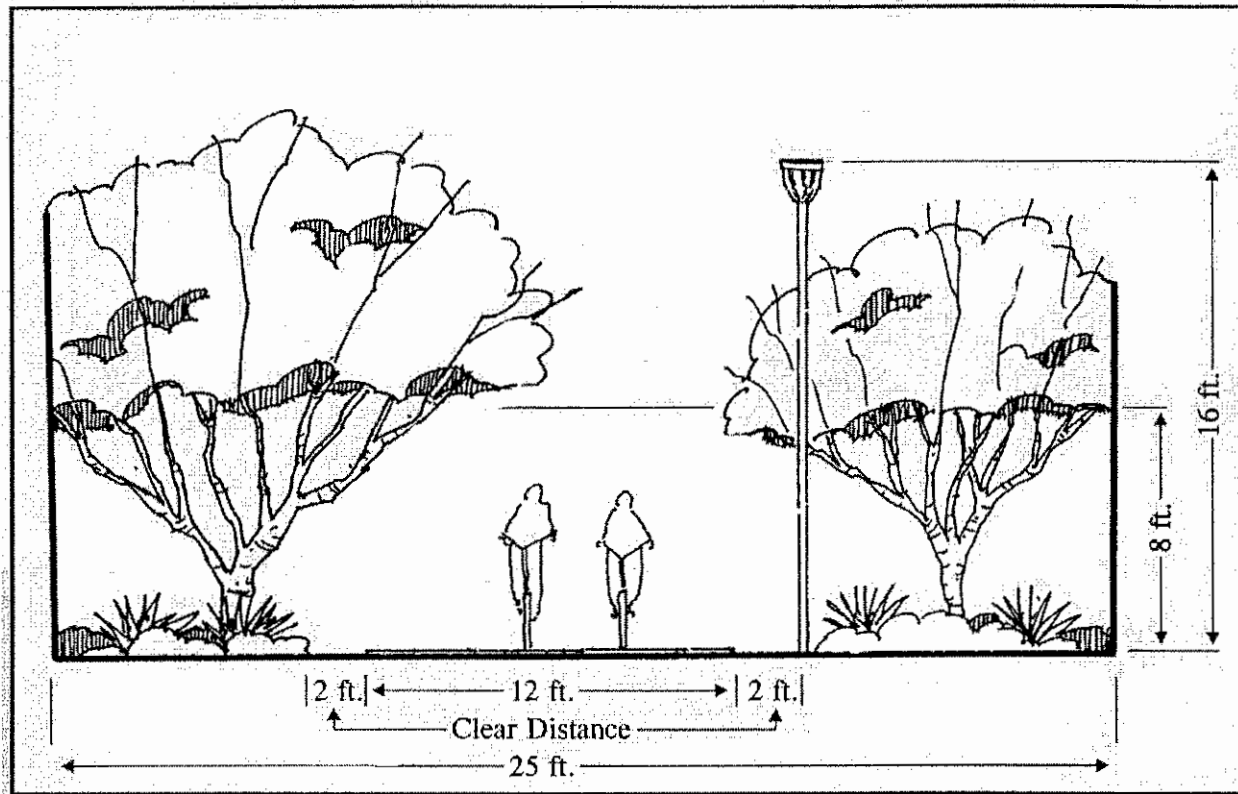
Recommended Path/Trail Section, Provided by the Tempe Multi-Use Path System Detailed Plan.
